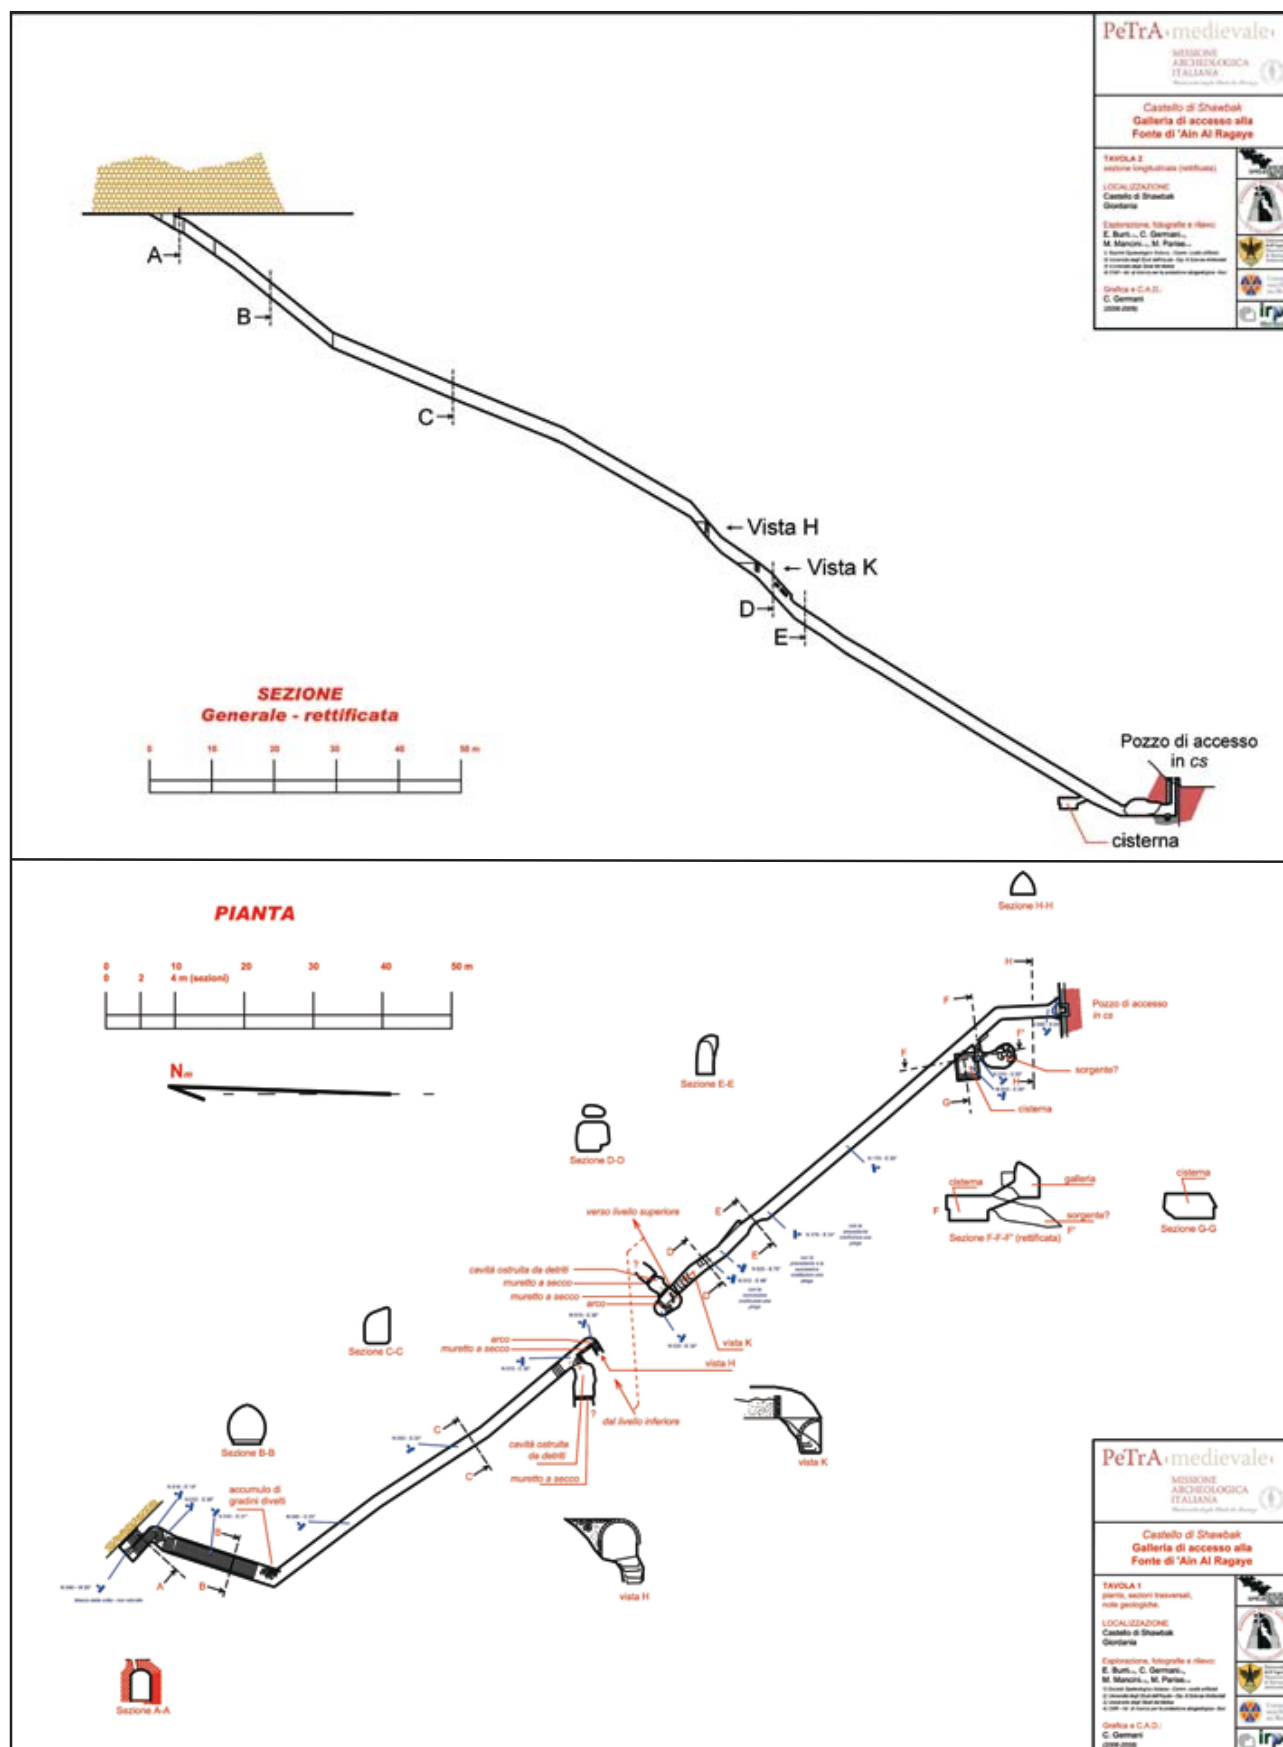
Floor plan, cutaways and rectified general section of Shawbak Castle tunnel (survey E. Burri, C. Germani, M. Parise; drawing C. Germani; SSI 2006, 2007).
